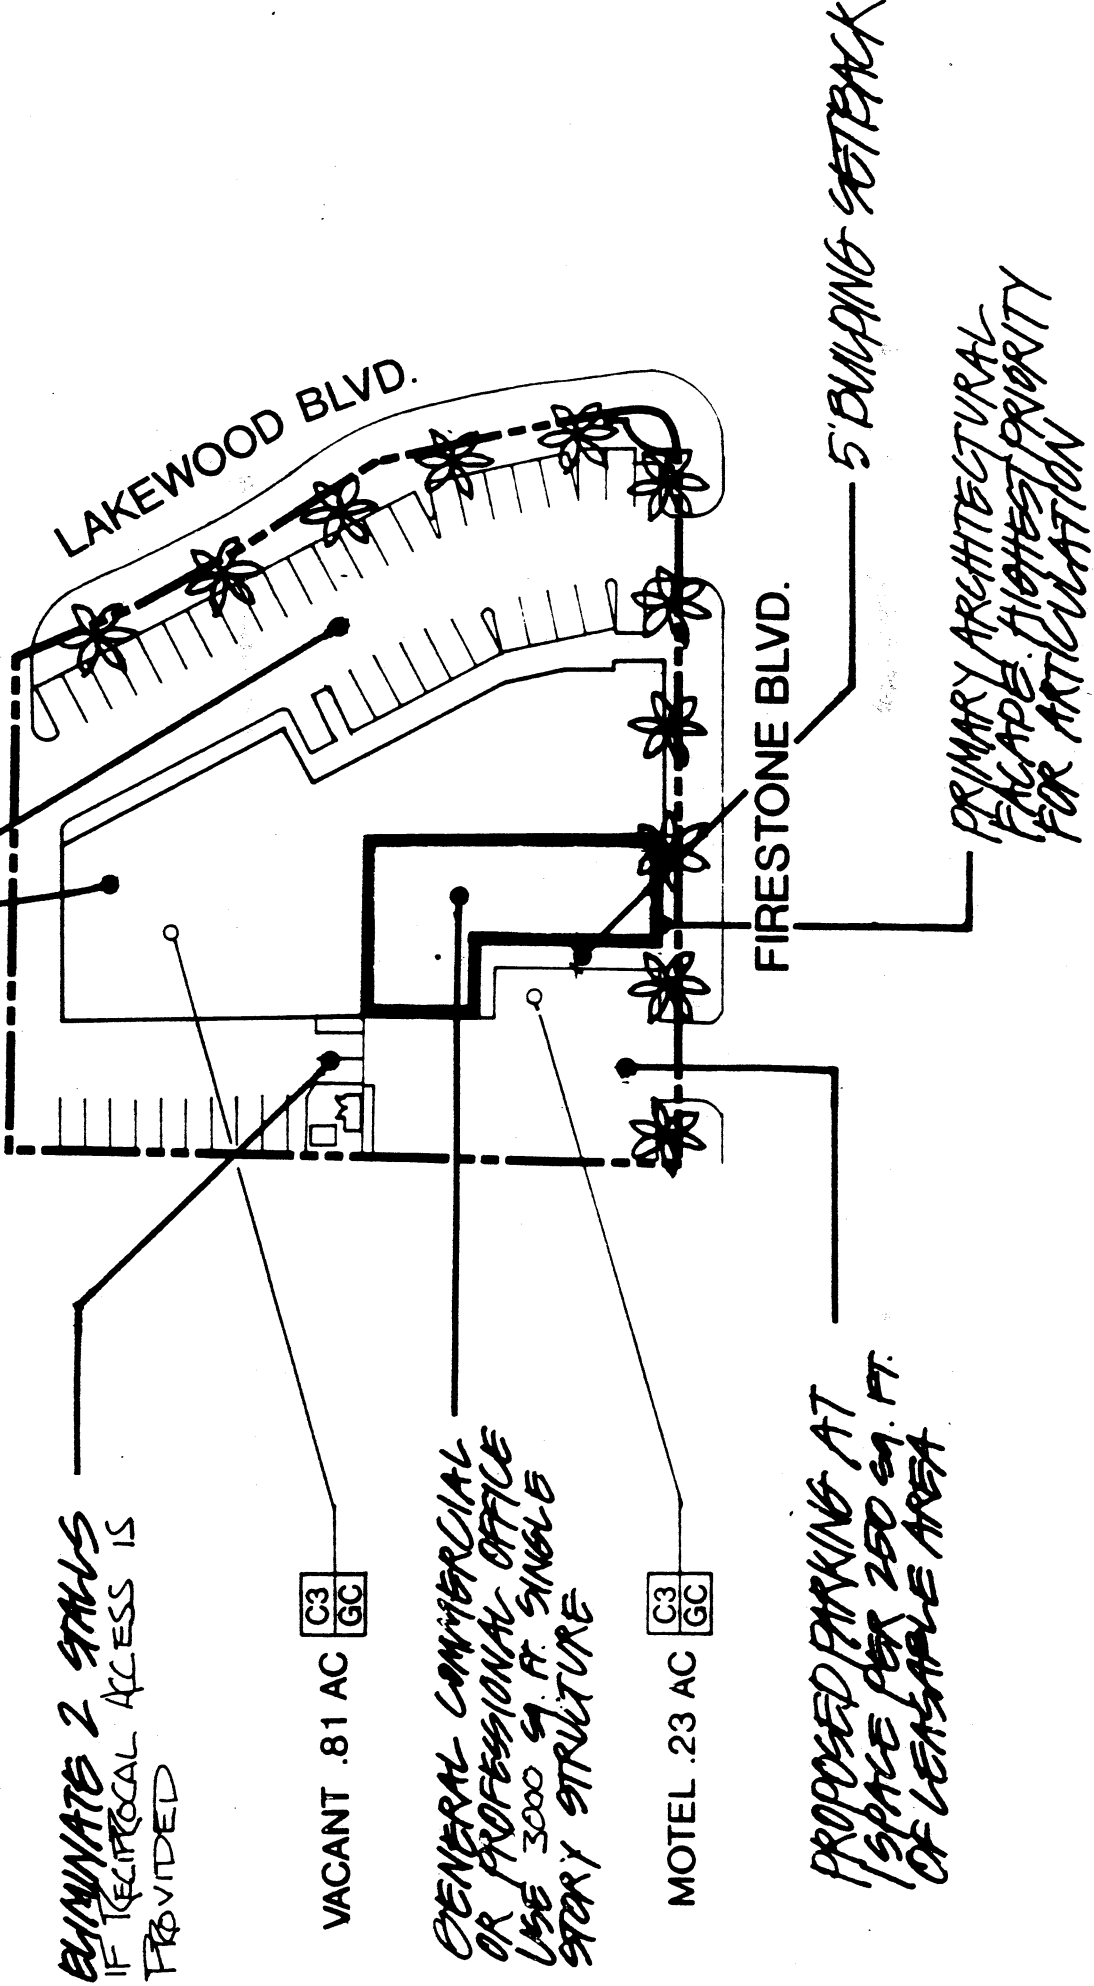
SUBAREA 2 BUILDING ENVELOPE
